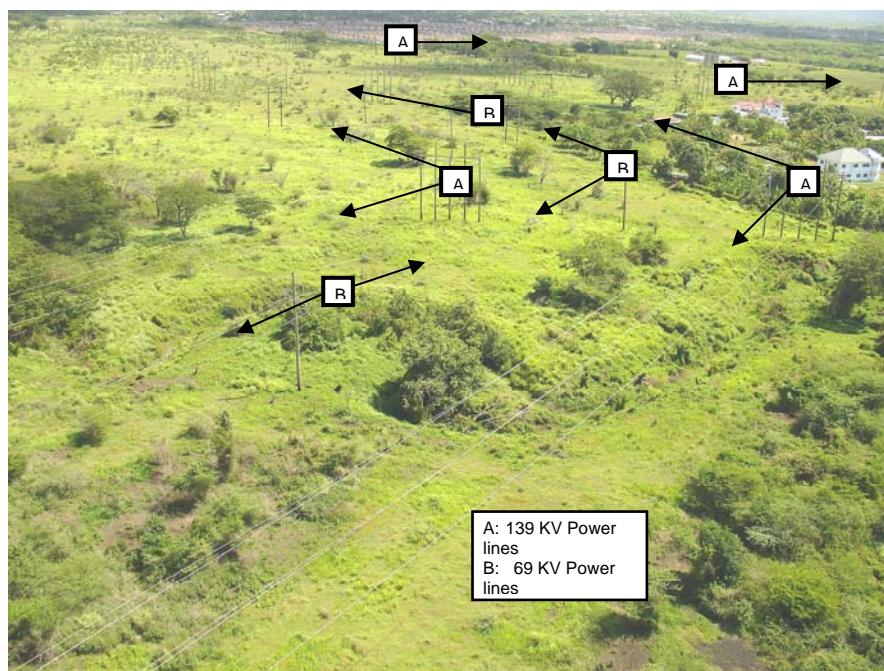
Oblique air photo of the existing layout of power lines transiting the Development Site.
